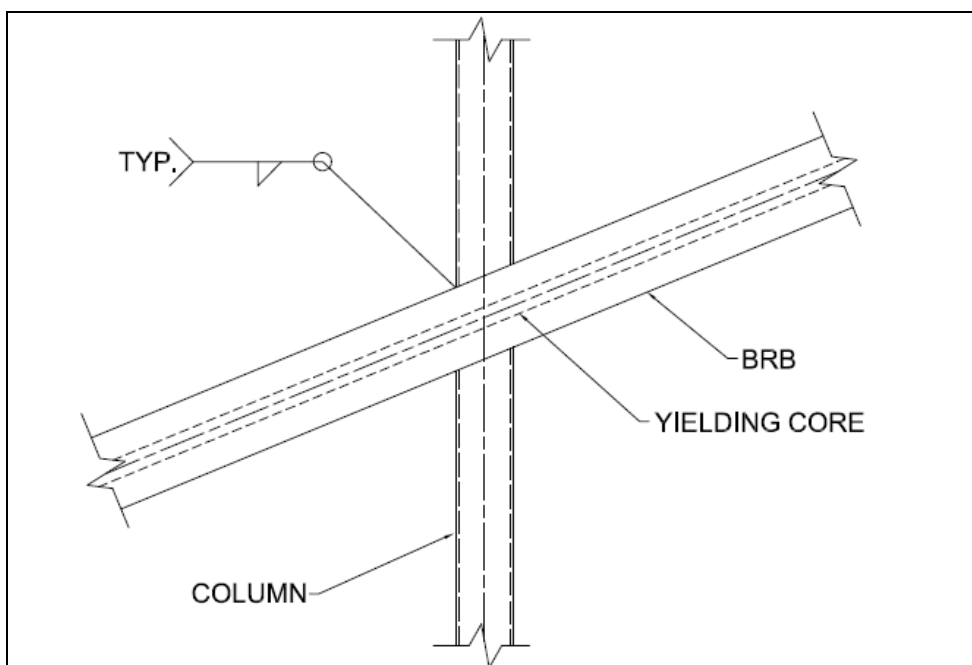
Column and BRB interface with Welded Connection
